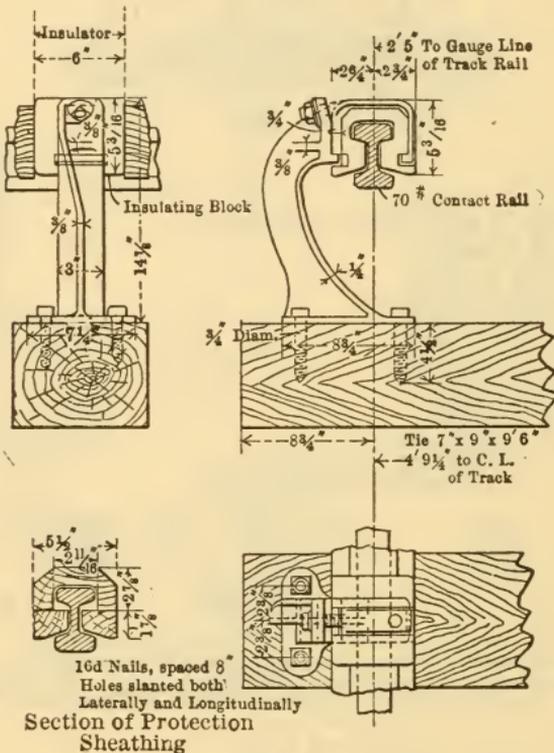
Details of Third Rail Construction, New York Central R.R.
